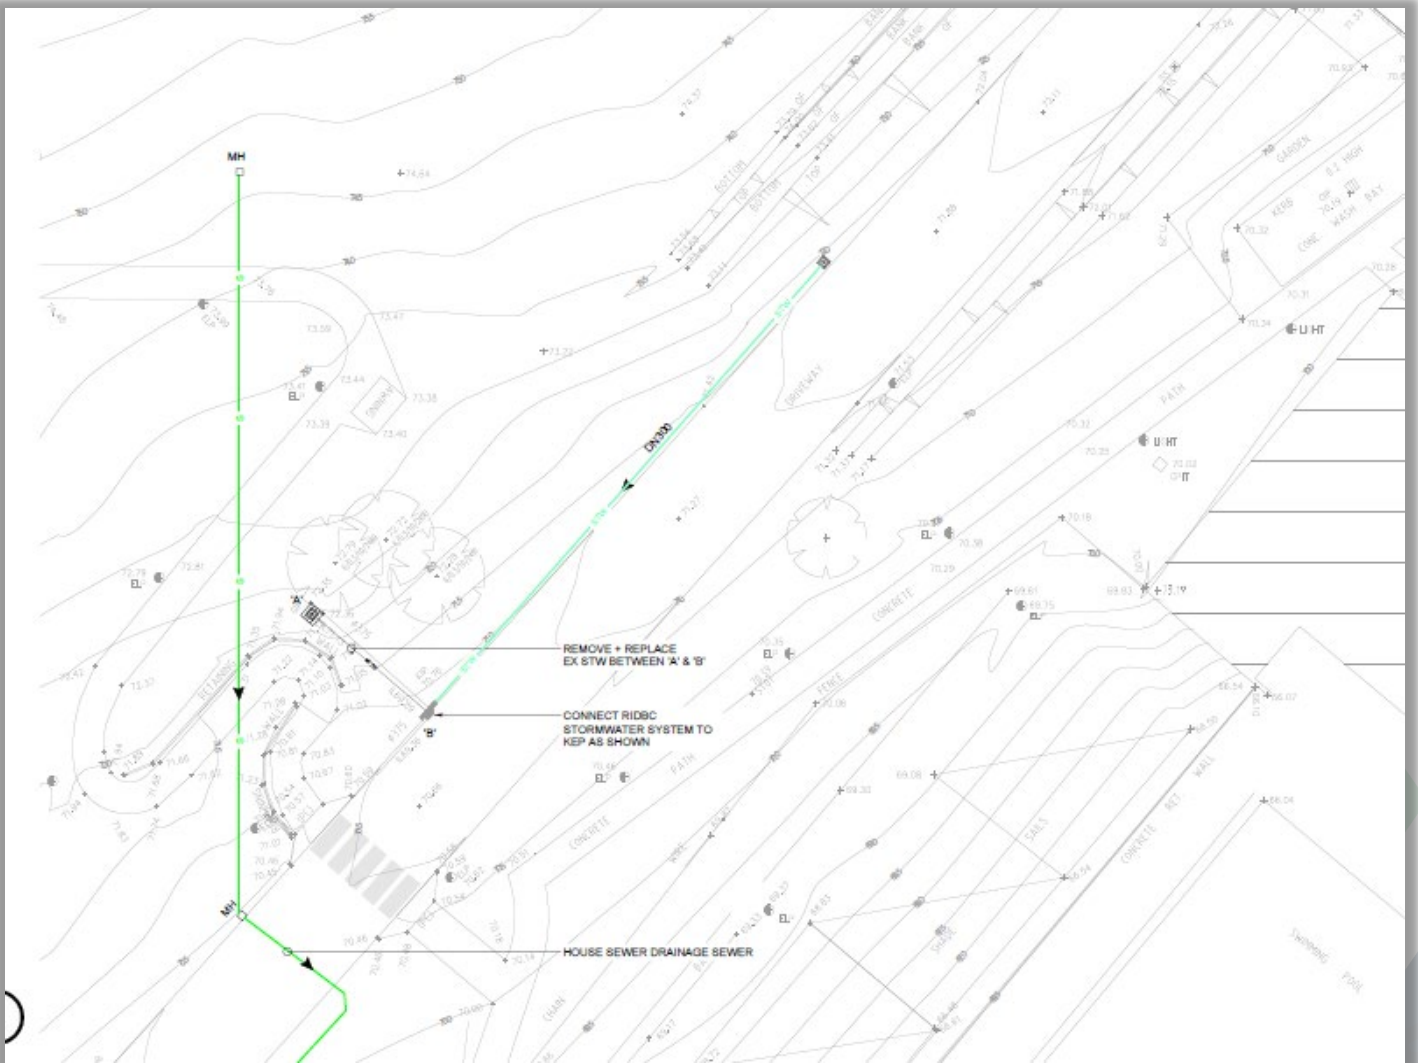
Image above shows the House and Stormwater alignment for pipes leaving the site
